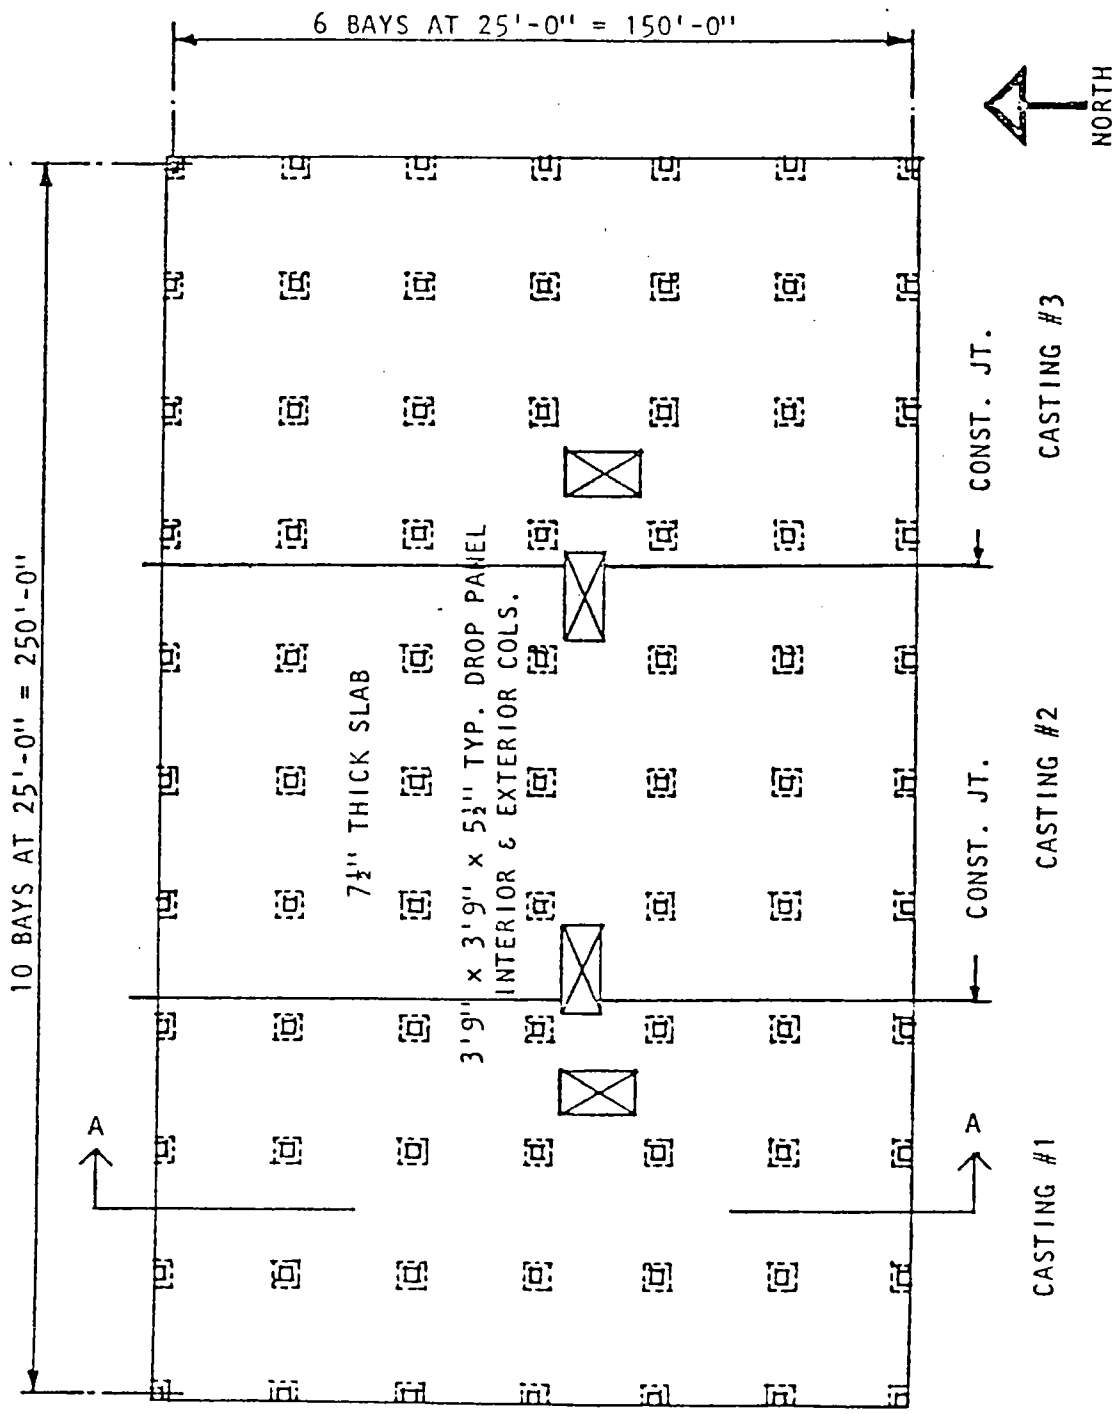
TYPICAL FLOOR PLAN OF AN OFFICE BUILDING
